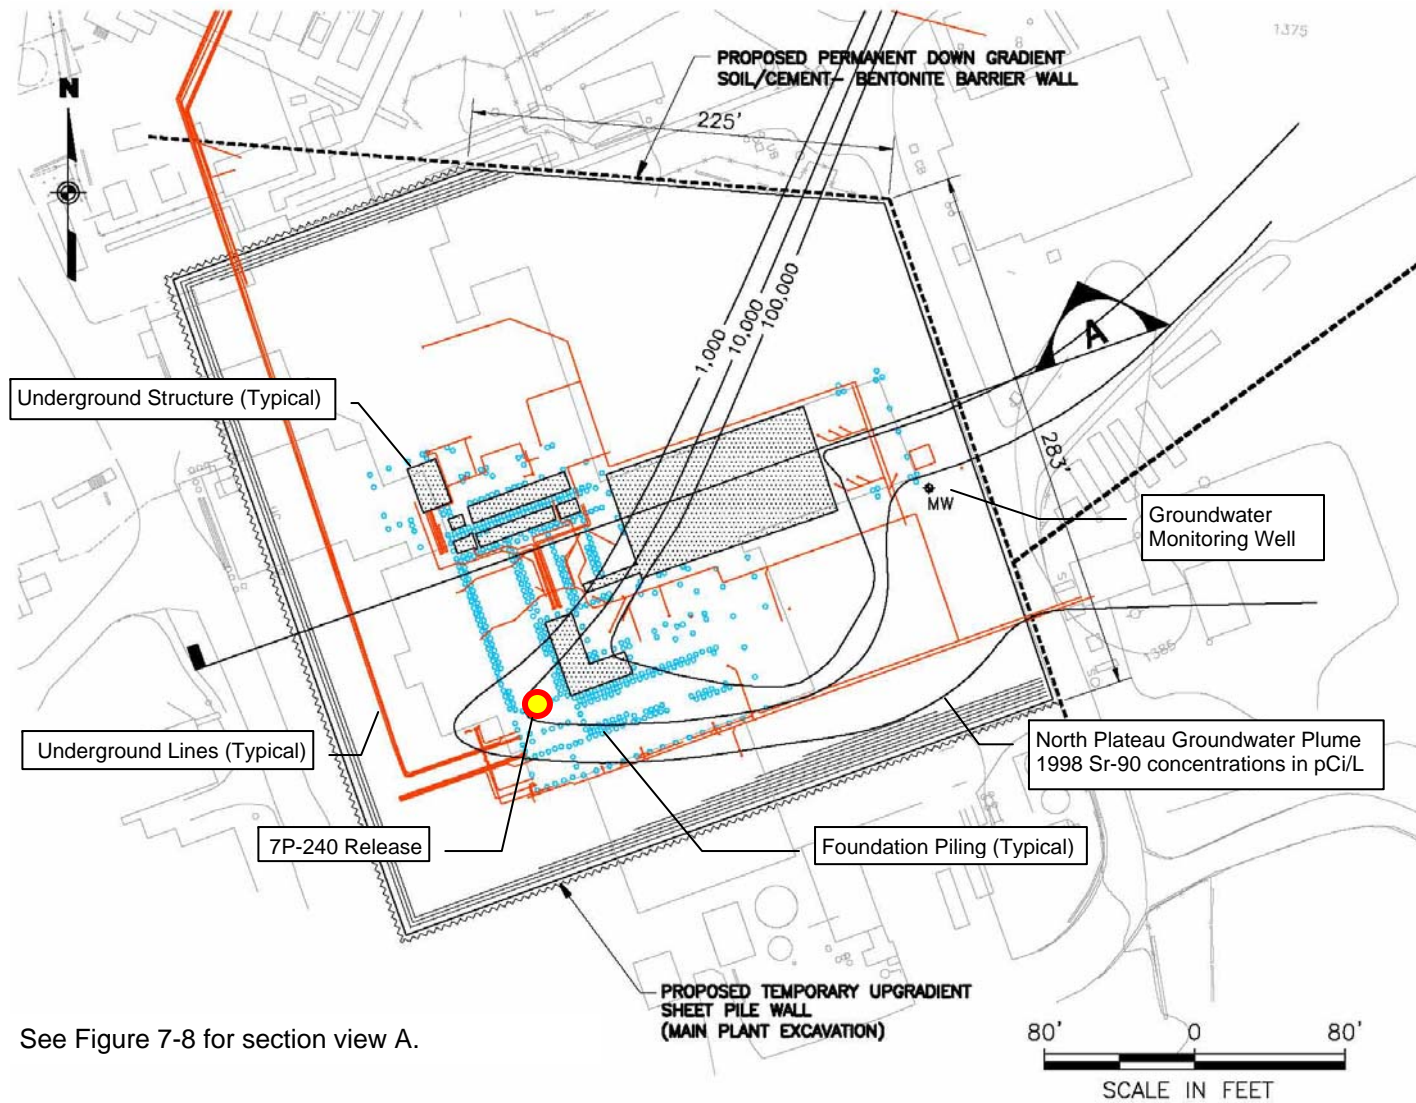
Conceptual Layout of WMA 1 Excavation
